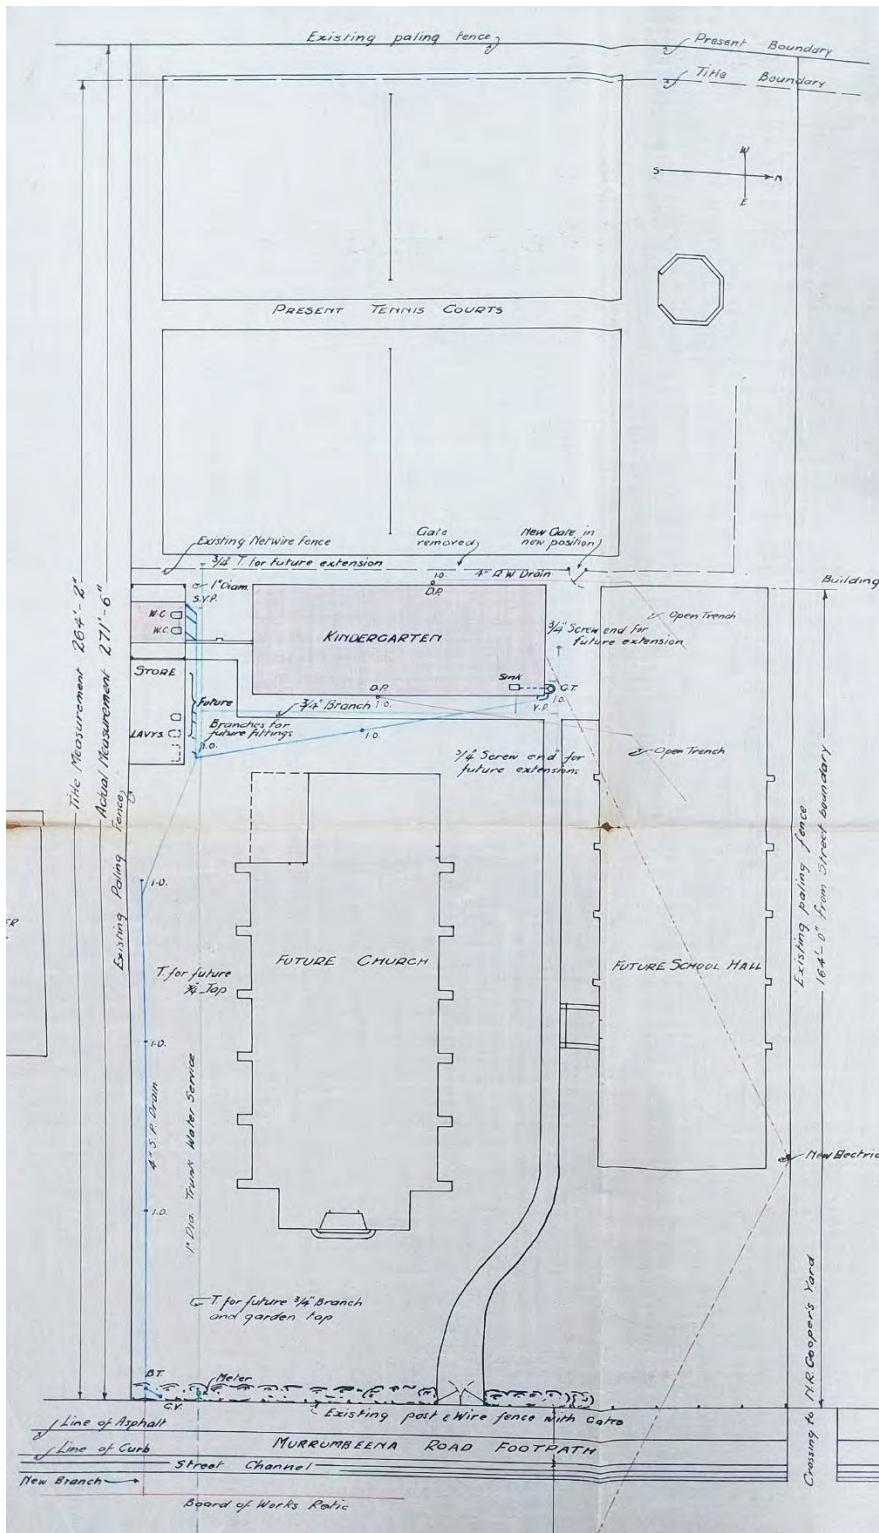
Site plan, October 1927, showing the proposed kindergarten hall (in red) and the footprints of proposed future buildings. Tennis courts existed at the west end of the site (top). Drawings by Haddon & Henderson (Source: PROV, PB File)
